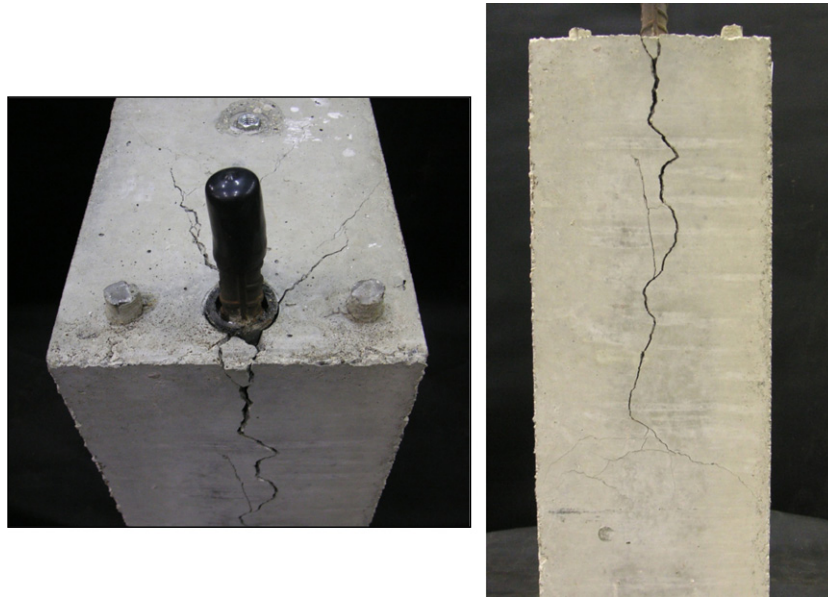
Typical splitting failure of beam-end specimen (BE-RAC2-50-375A).
